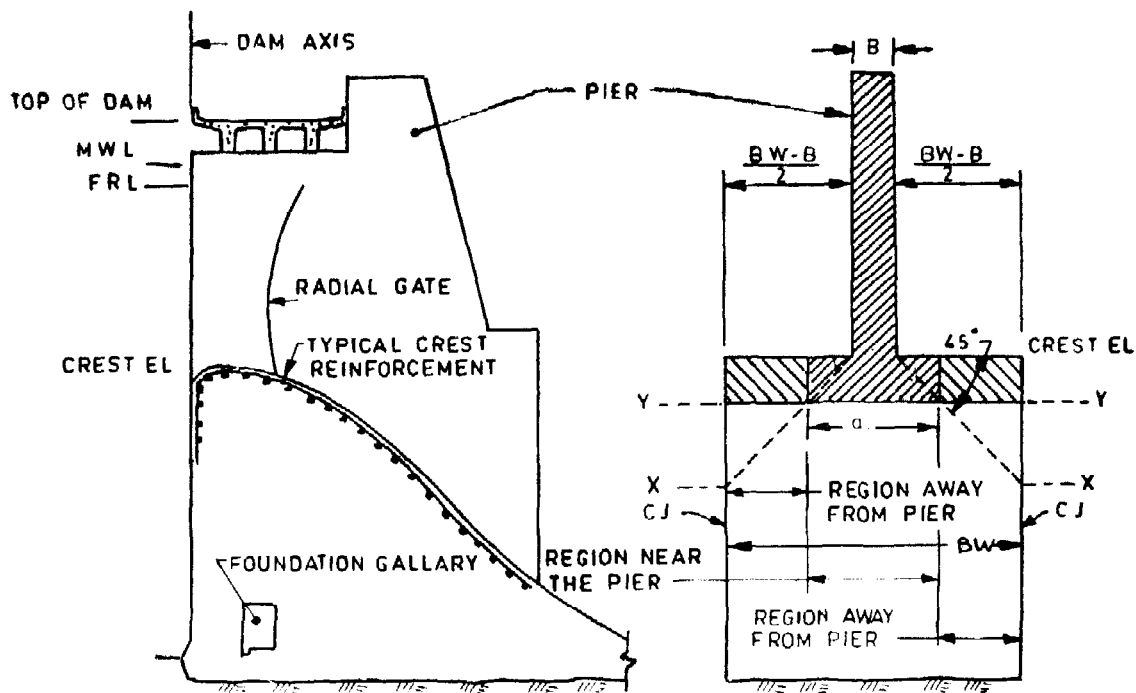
LOAD DISPERSION OF THE WEIGHT OF PIER ON SPILLWAY STRUCTURE
